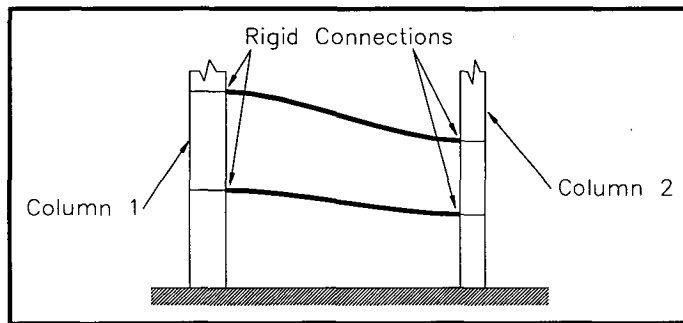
The effect of slab and beam deformations, when differential shortening occurs between columns 1 and 2 for the given connections.
